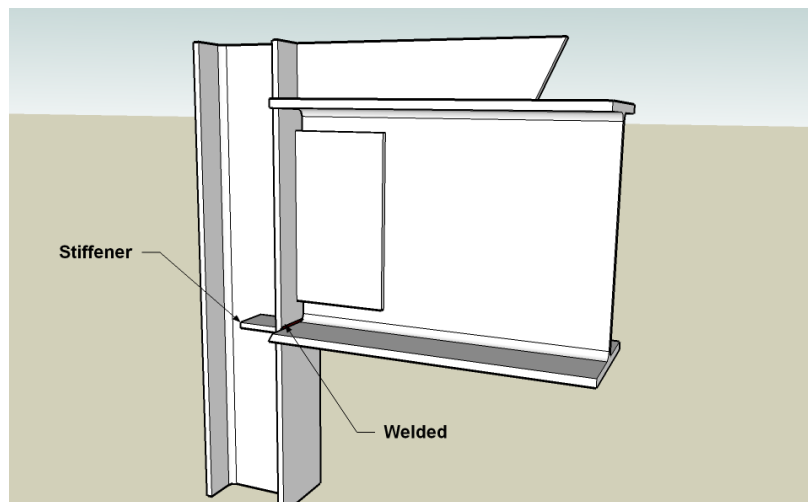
Details of reinforcement: stiffener and welded flanges
